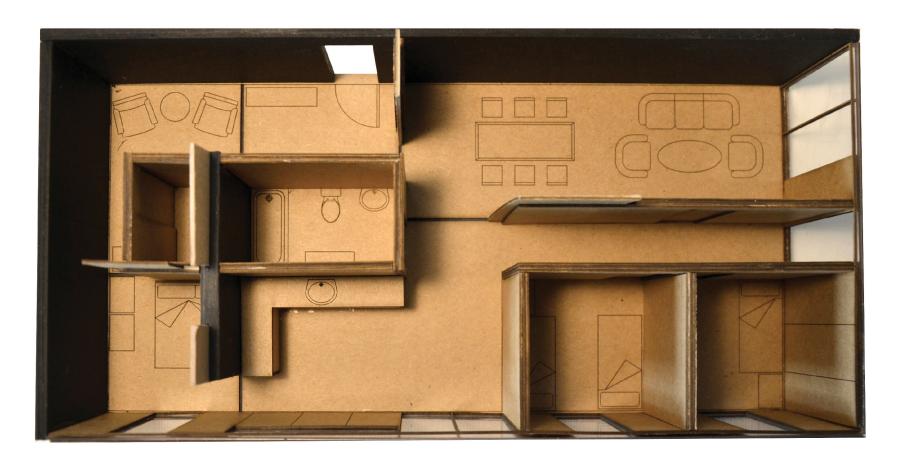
Unit model demonstrates floor plans and flexibility in utilizing or concealing additional walls for privacy.
